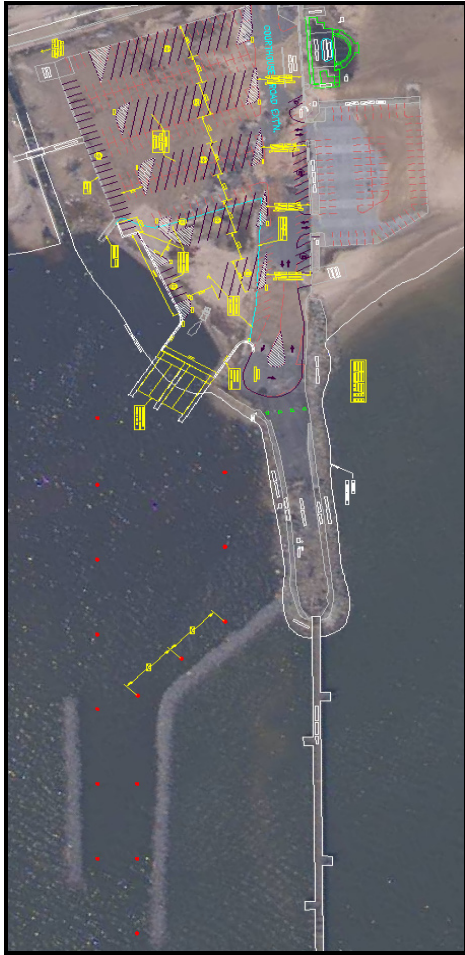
Plan of Improvements Overlain on Post-Katrina Photo
